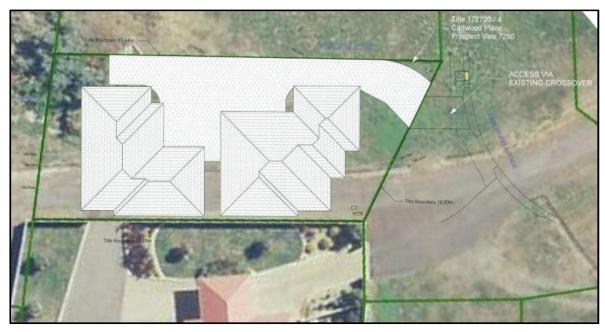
The proposed multiple dwellings on the subject site - 17 Carlwood Place, Prospect Vale (CT:172720/4)
